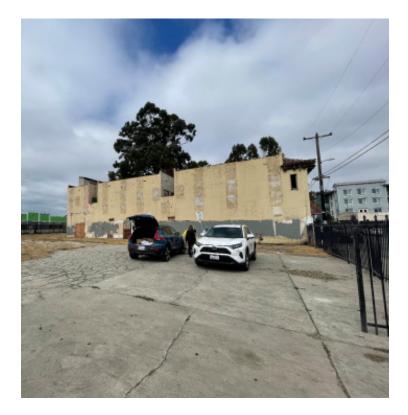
View from corner of Market Way and Soledad Street, TEF Design, 2024.
